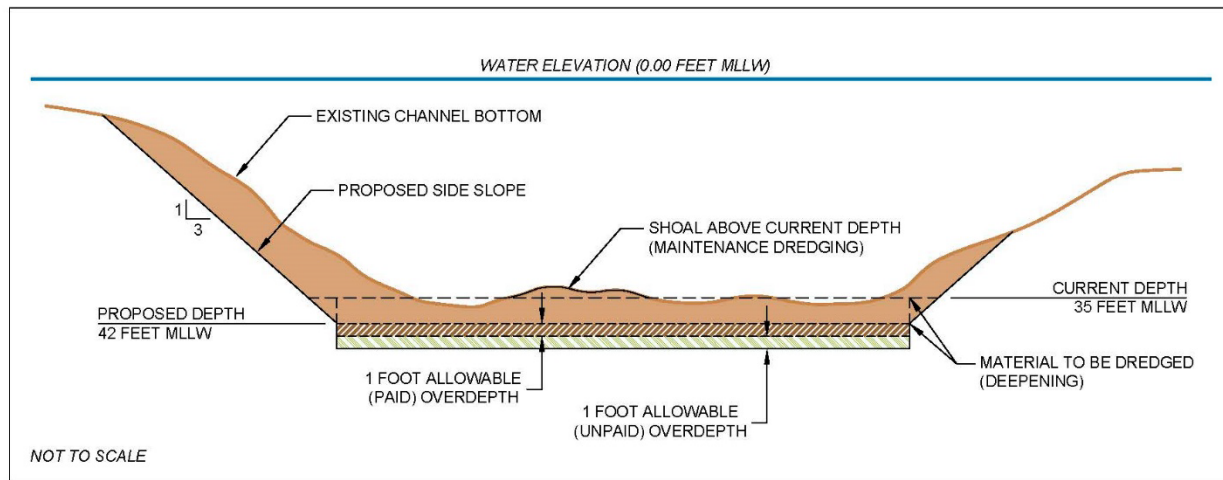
Typical BHR Channel Sediment Trap Cross Section.
